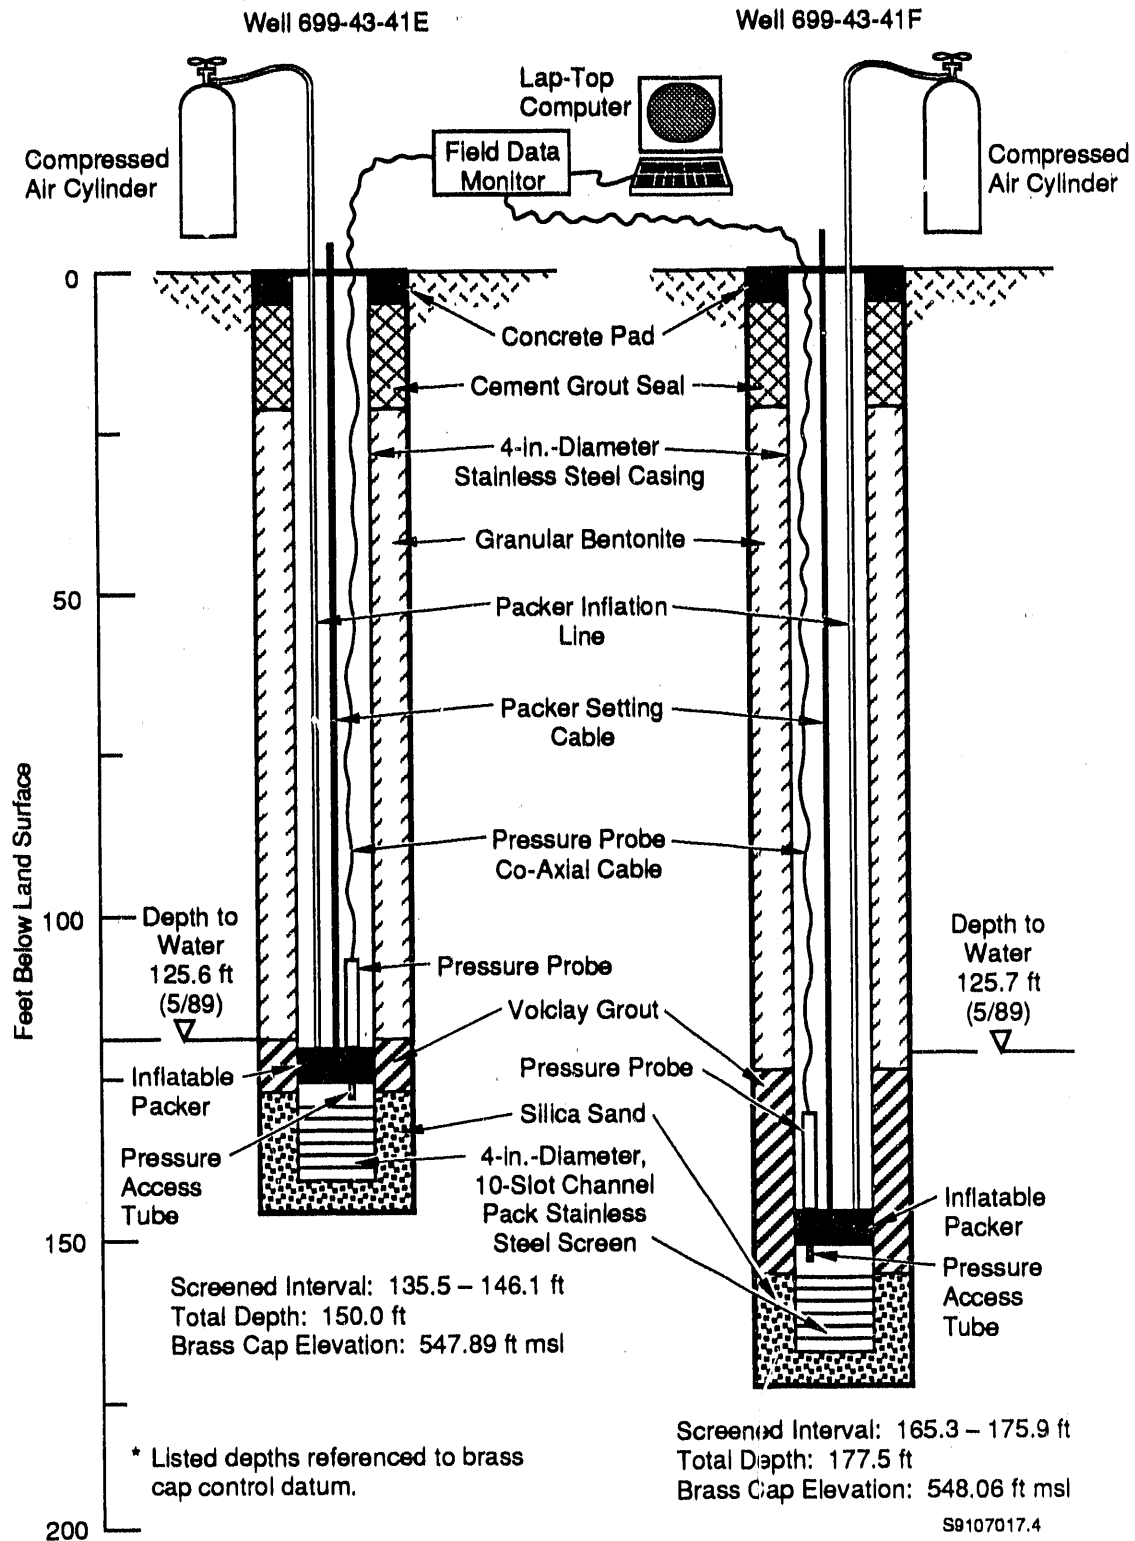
Construction As-Built and Test Equipment Installations for Observation Wells 699-43-41E and 699-43-41F
